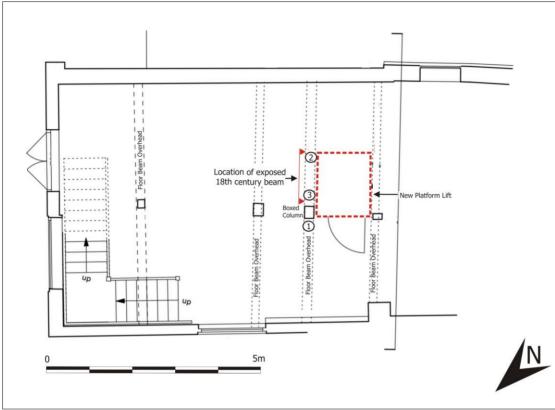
Ground Floor Plan with location of new lift in red and photo locations numbered.
